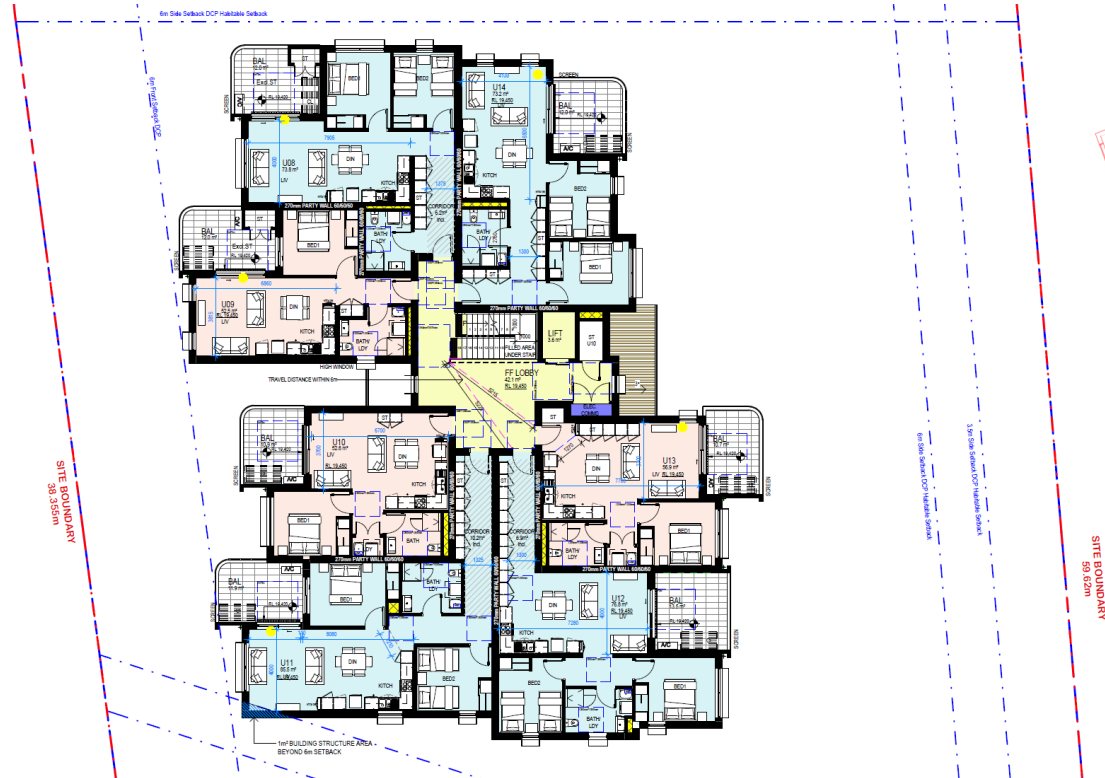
Extract from Architectural Plans – First Level (Source: Architectural Plans, SARM Architects, dated 20/05/2025)
